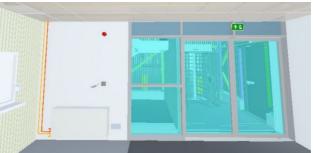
Site/BIM pair of an architectural wall with radiator, pipes, and large glazed openings
